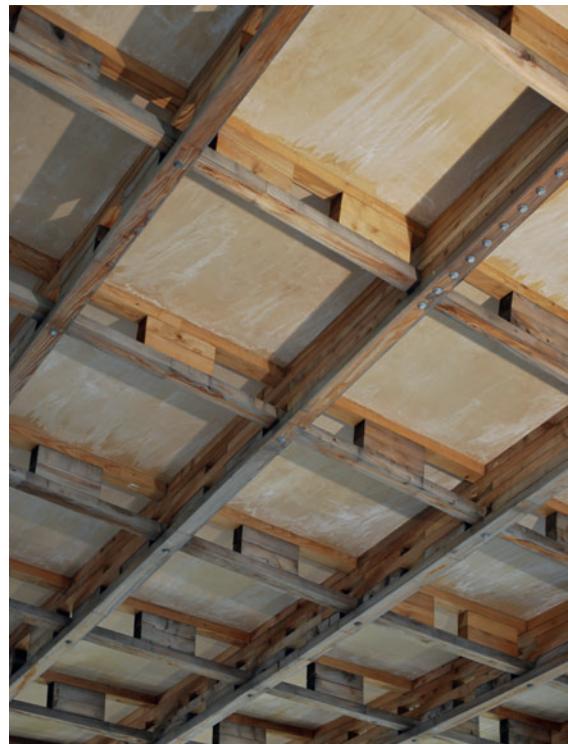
Internal view of the Savill Garden gridshell showing plywood decking
